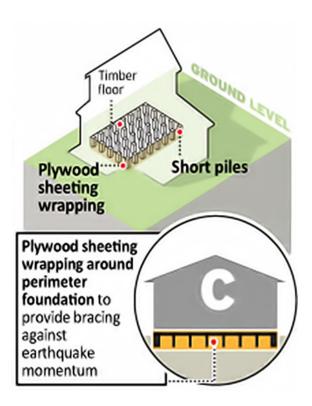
Surface structures with Shallow Foundations - suitable for building on worst affected grounds and used with site ground treatment techniques, 2012; from New Zealand Building Performance.
